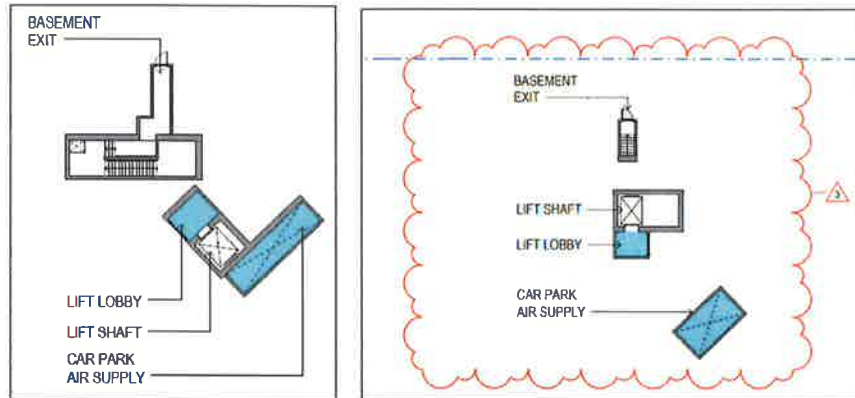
| The approved (left) location and proposed (right) layout of the ground floor elements due to relocation of the Building R5 core (Base Source: RPBW Architects)
